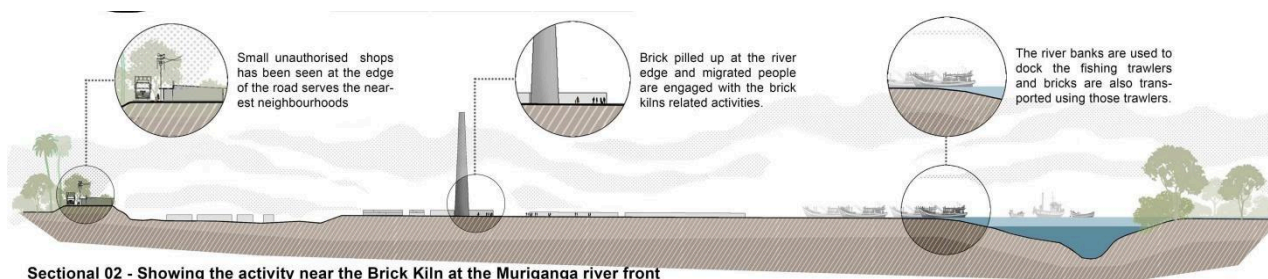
Brick Kiln ,kainagar [Source - Author]
